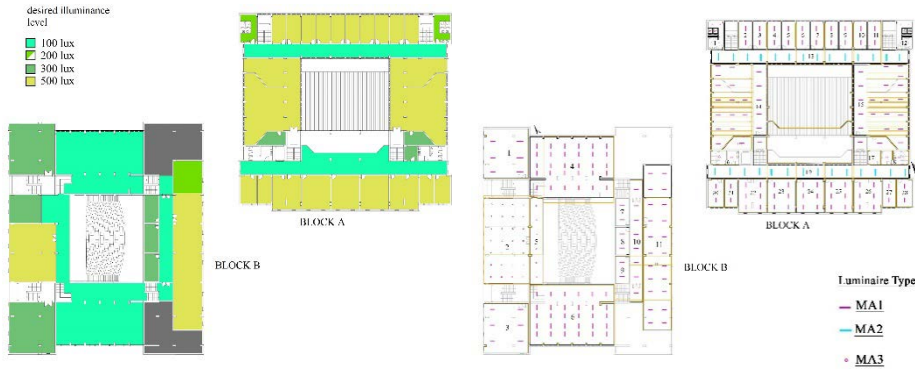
Second Floor Plan and Existing Artificial Lighting Layout
